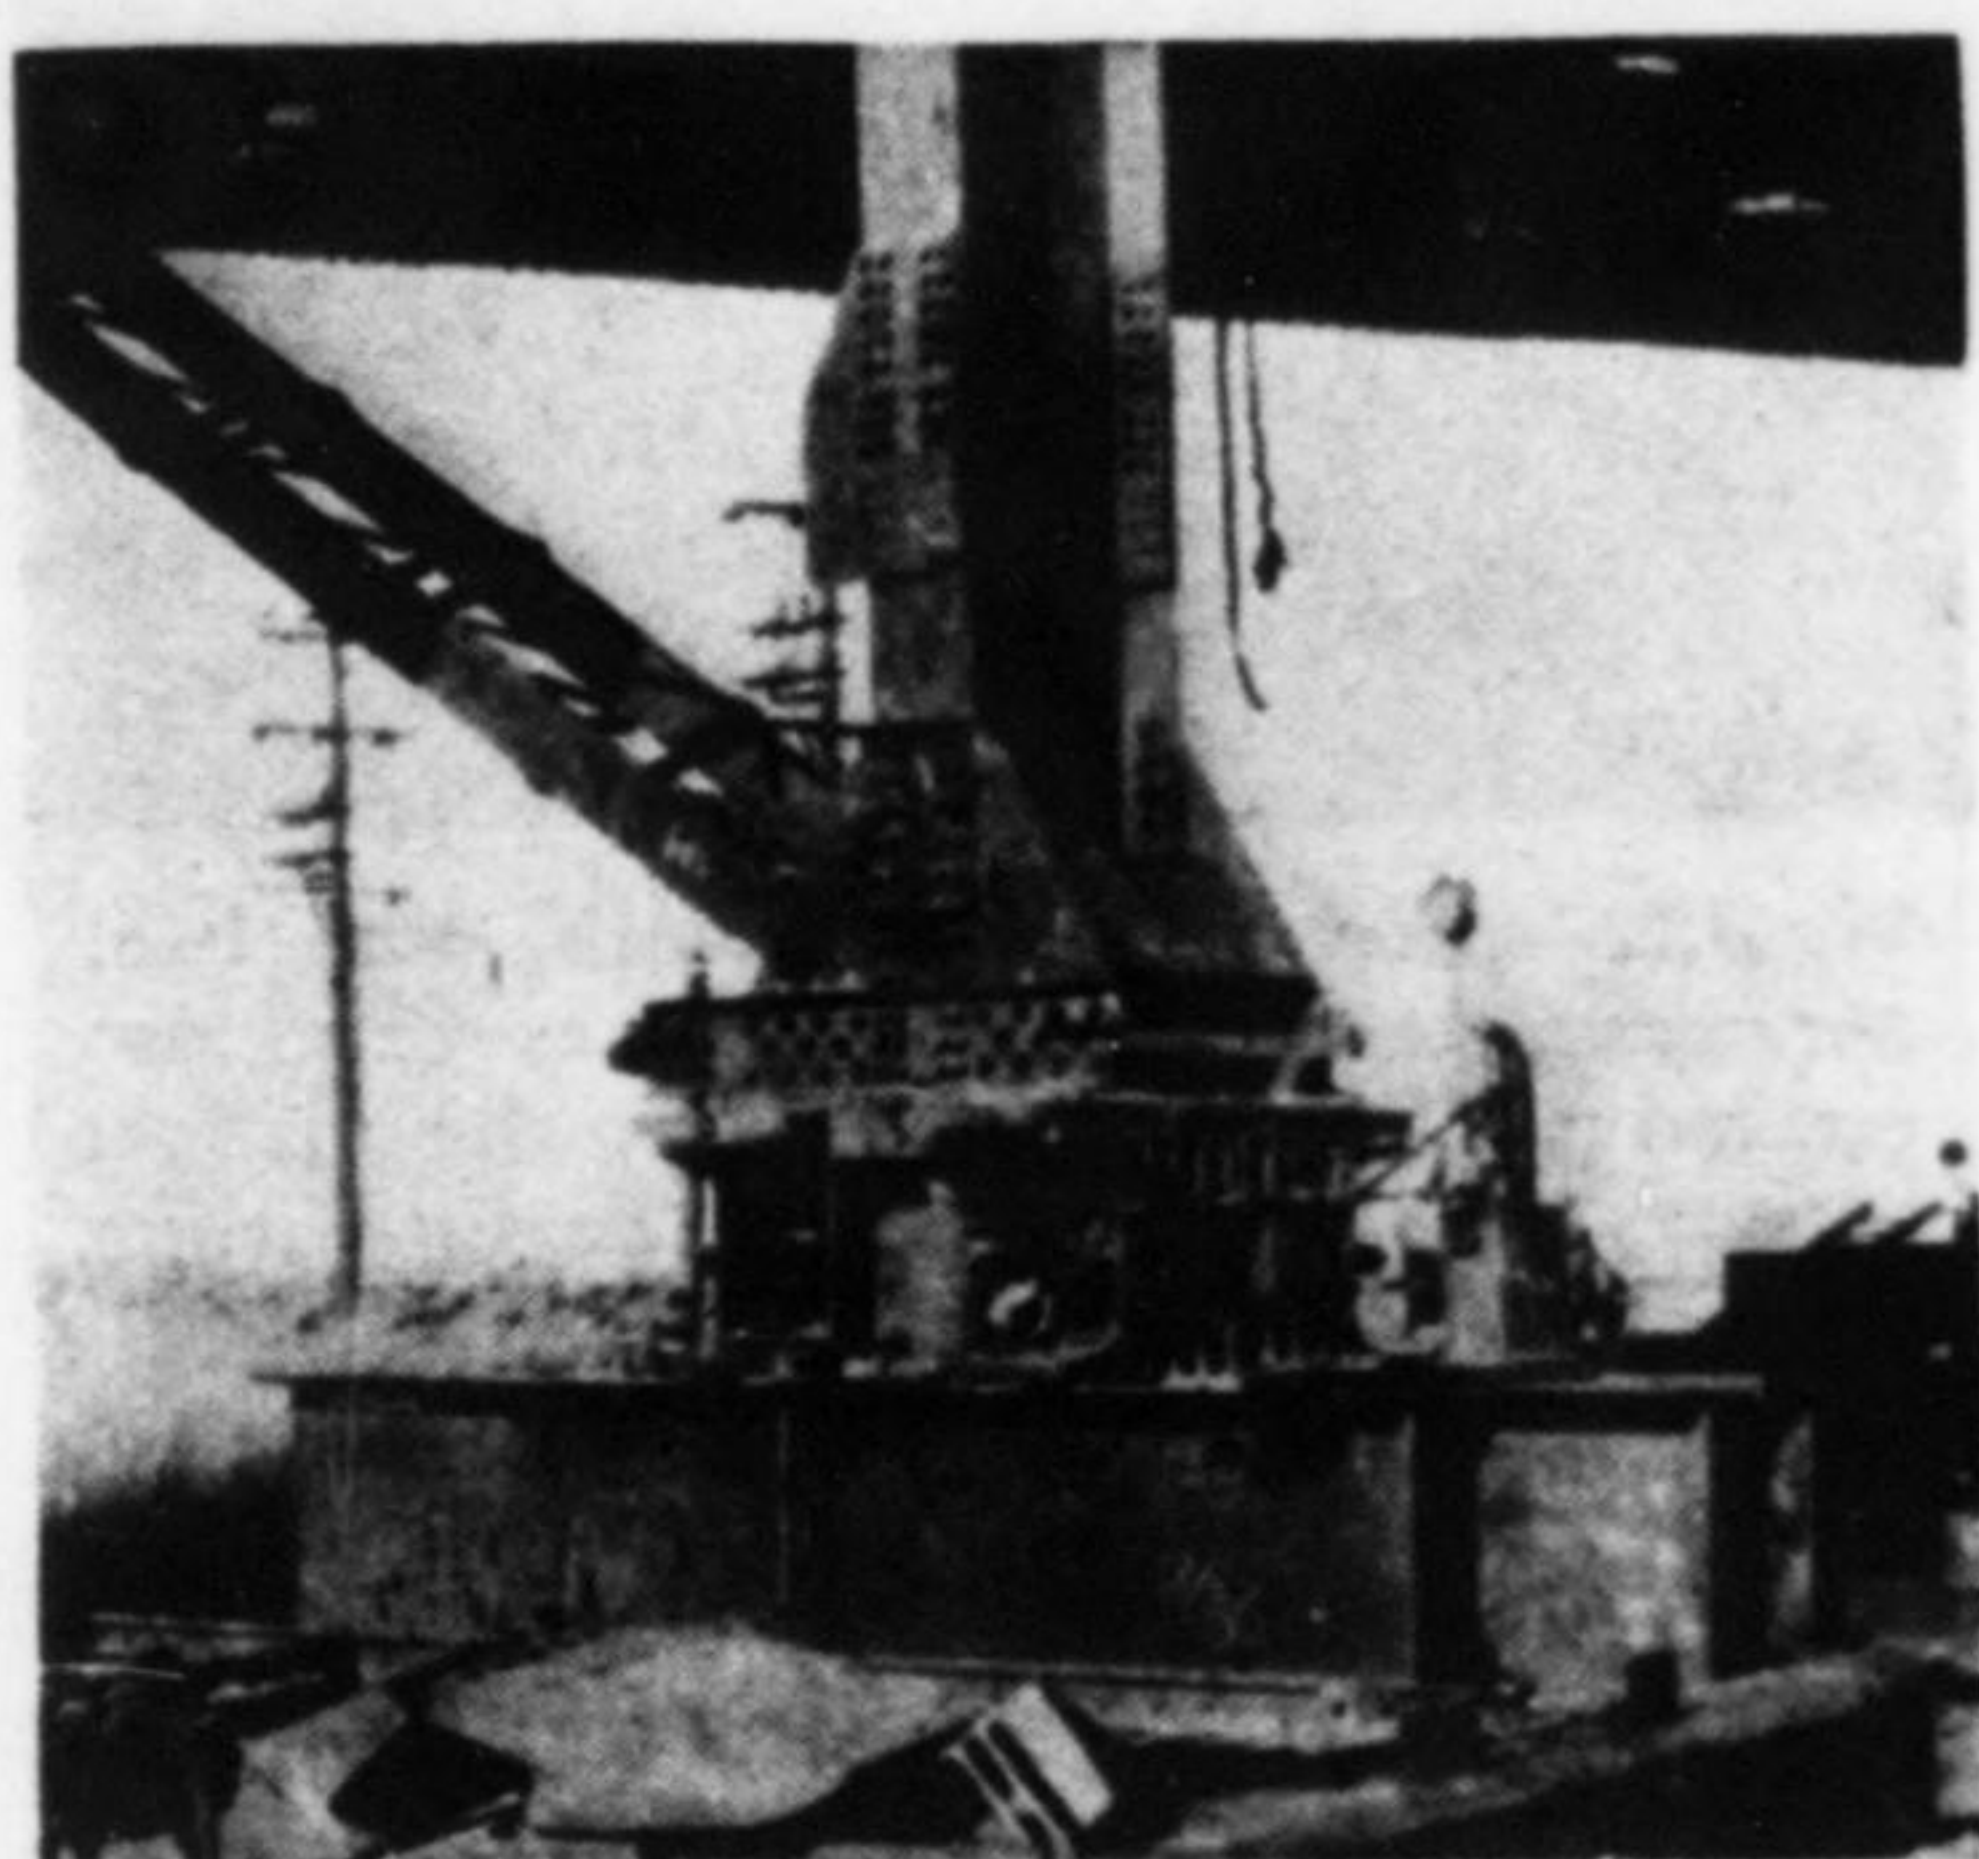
Ramps introduced special difficulties. View is on McClintic-Marshall section where ramp required 148-ft.-span plate girders.
